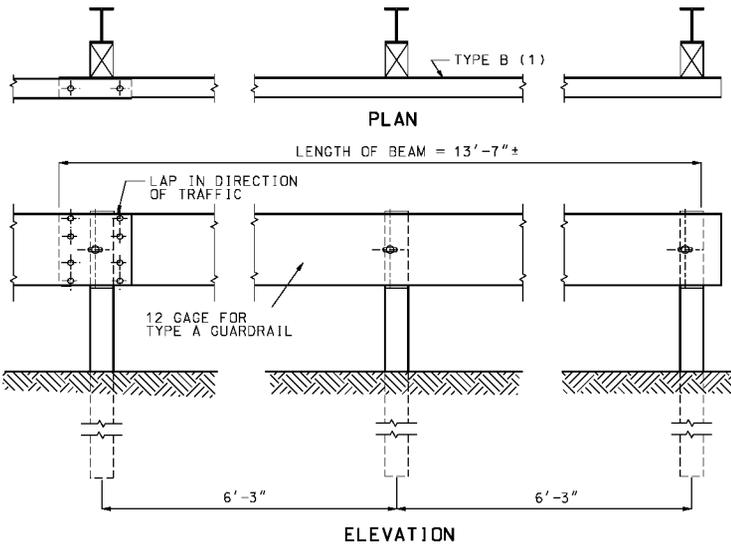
DETAIL FOR TRANSITIONING BETWEEN TYPE A AND TYPE B GUARDRAIL
